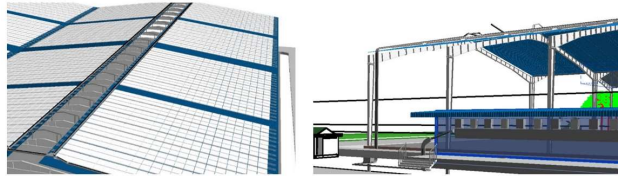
3D illustration photos of solar panel arrays (on the building roof)
